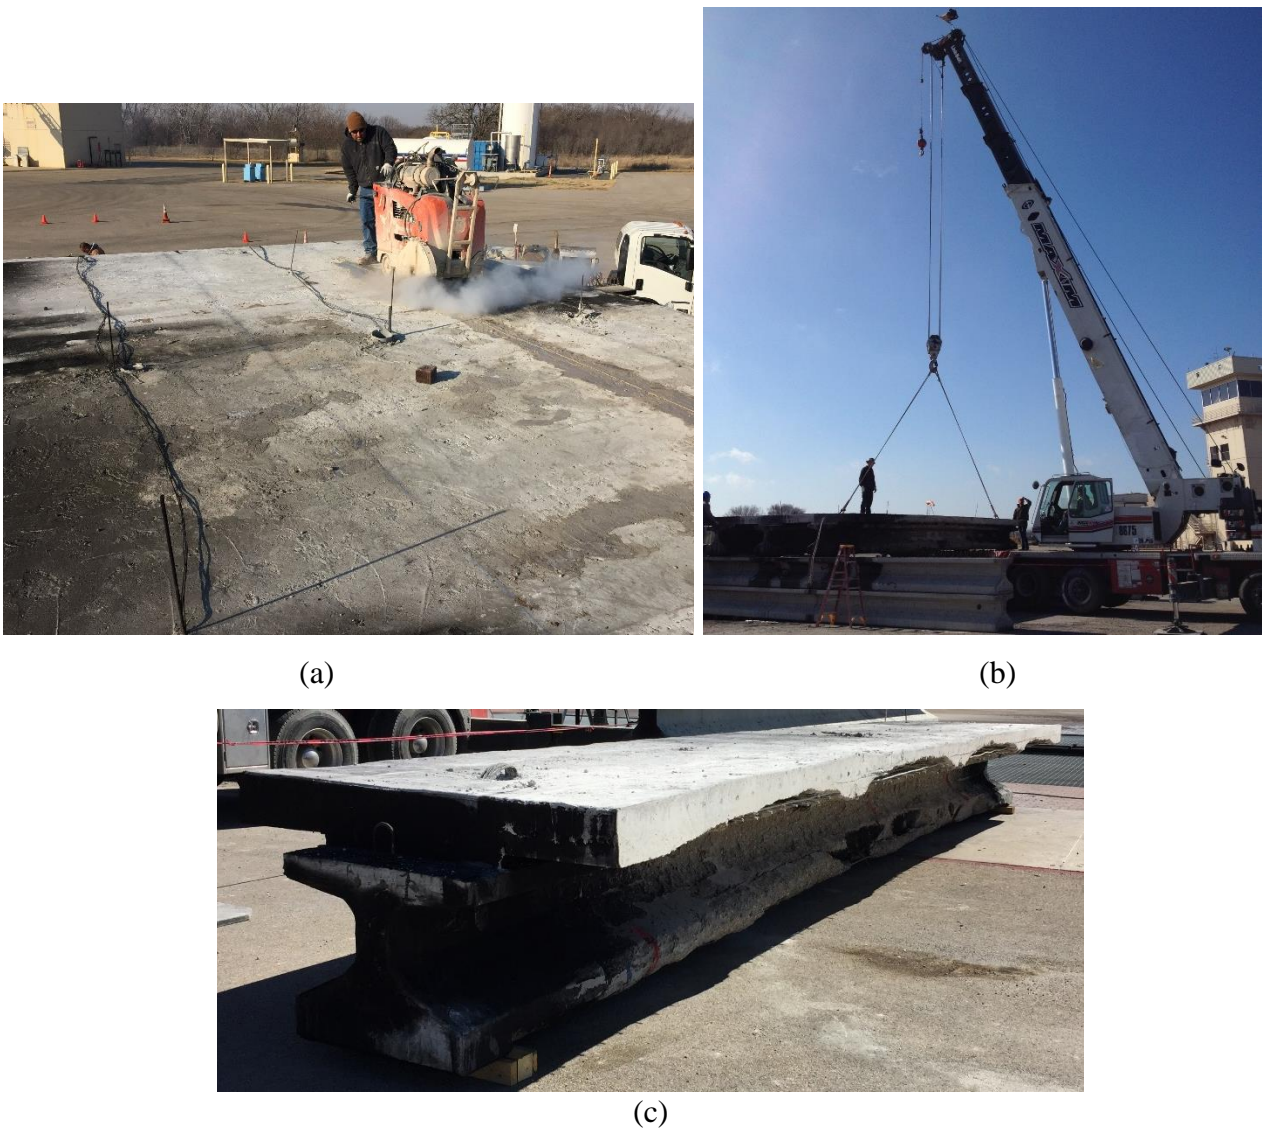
(a) saw-cutting of the deck; (b) lifting of the girder; (c) Girder-1 after saw-cutting
